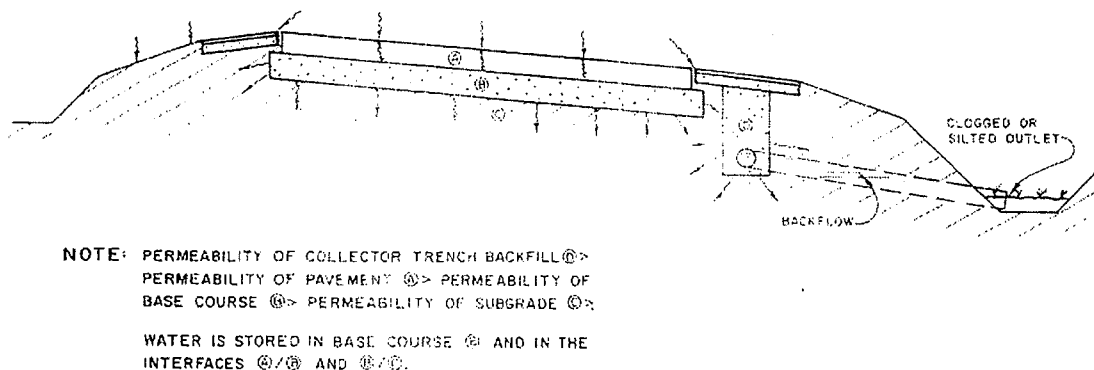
The impacts of a plugged outlet pipe (FHWA 1973).
